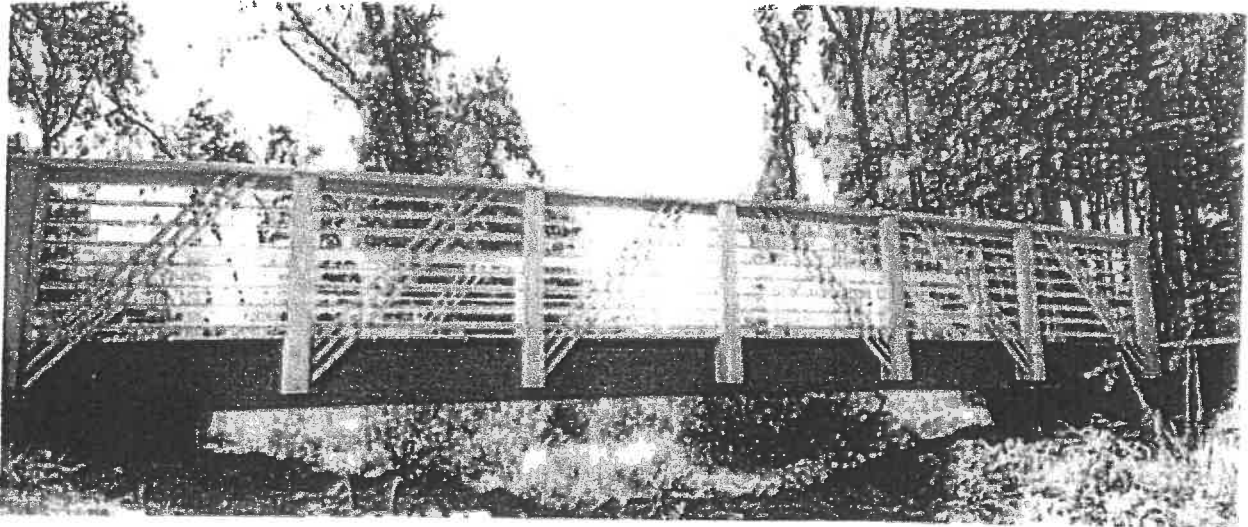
Elevation - Contech Continental Pedestrian Truss Bridge
